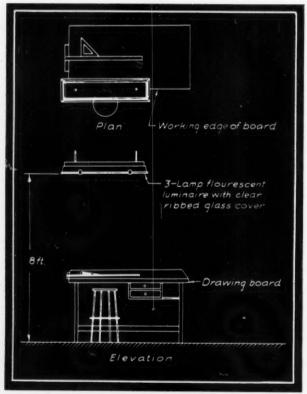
Covers of clear, ribbed glass, properly oriented, make possible the use of direct-lighting fixtures
